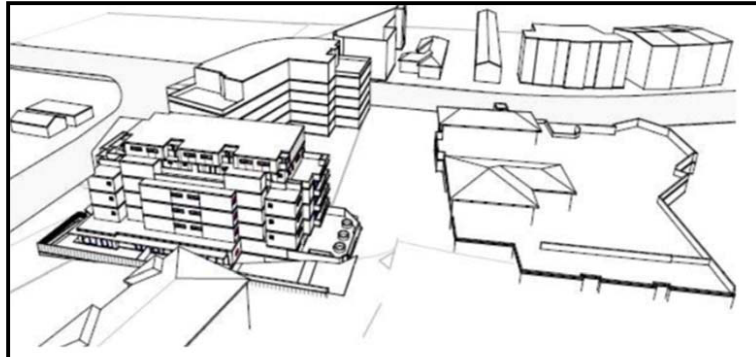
View from the south east. Significant additional built form anticipated on the vacant site and Club site to the north and north east due to the height and FSR controls. Site will provide a transition both from Milton Lane and Milton Street with the reduced height and bulk.
